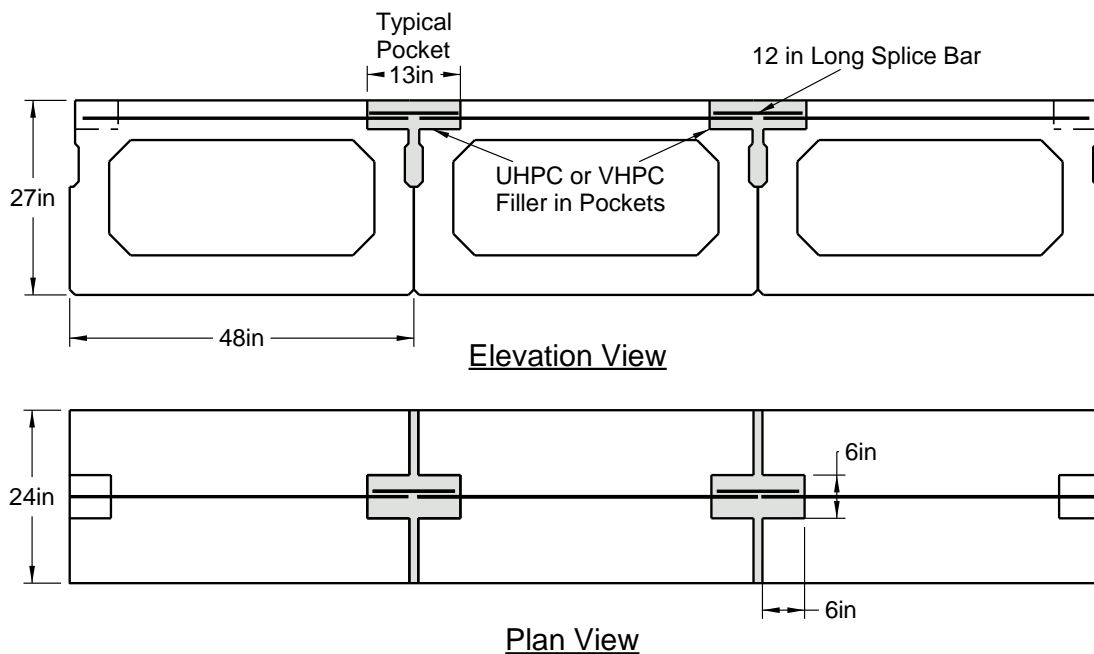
Halbe's UHPC/VHPC Adjacent Box Beam Connection
